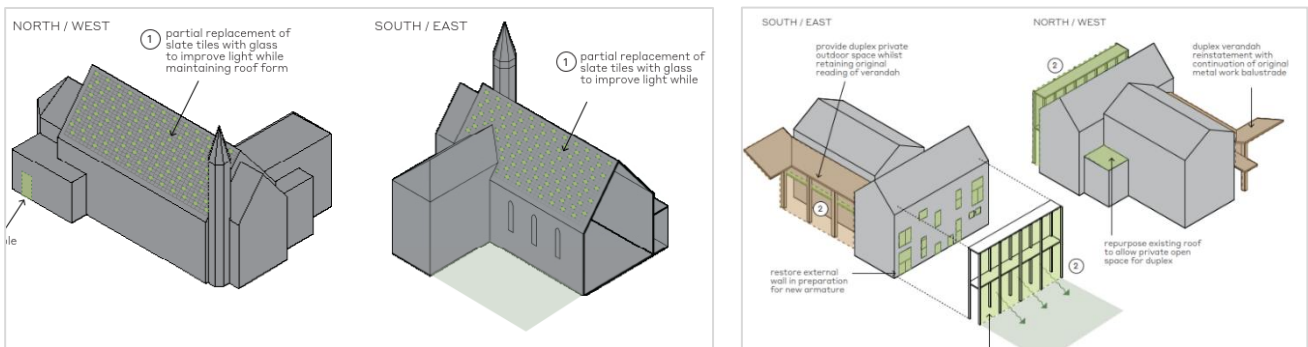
Proposed works to chapel (left) and north-east extension to 1907 building (right) (KTA).
